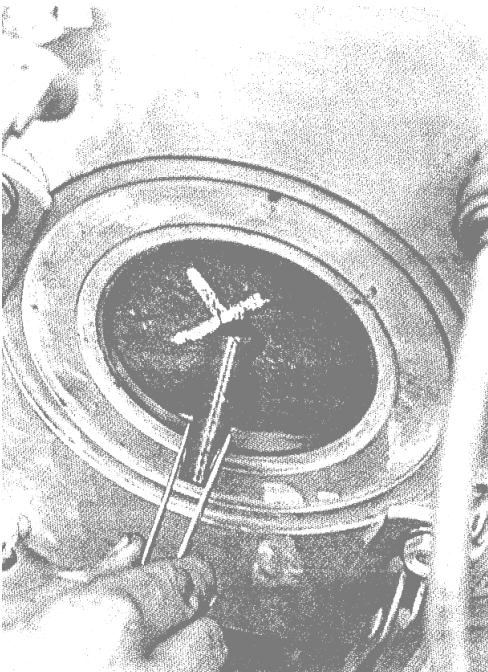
The drilled core is broken with the screwdriver and removed in its full 65 mm length by means of the tweezers.
